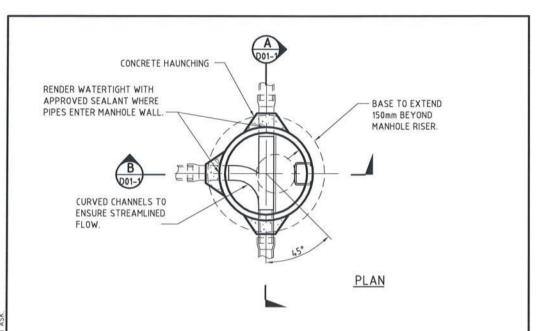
D01-2 Standard Manhole Typical Details Plan View
